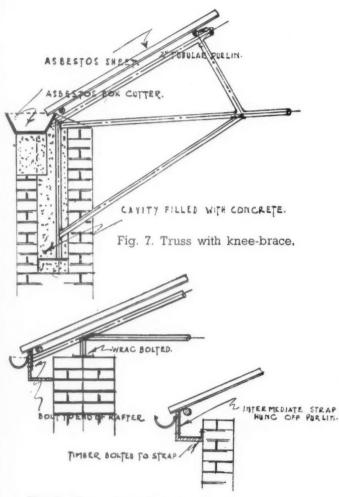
Truss wrag bolted and with gutter strap suspended from purlin.
